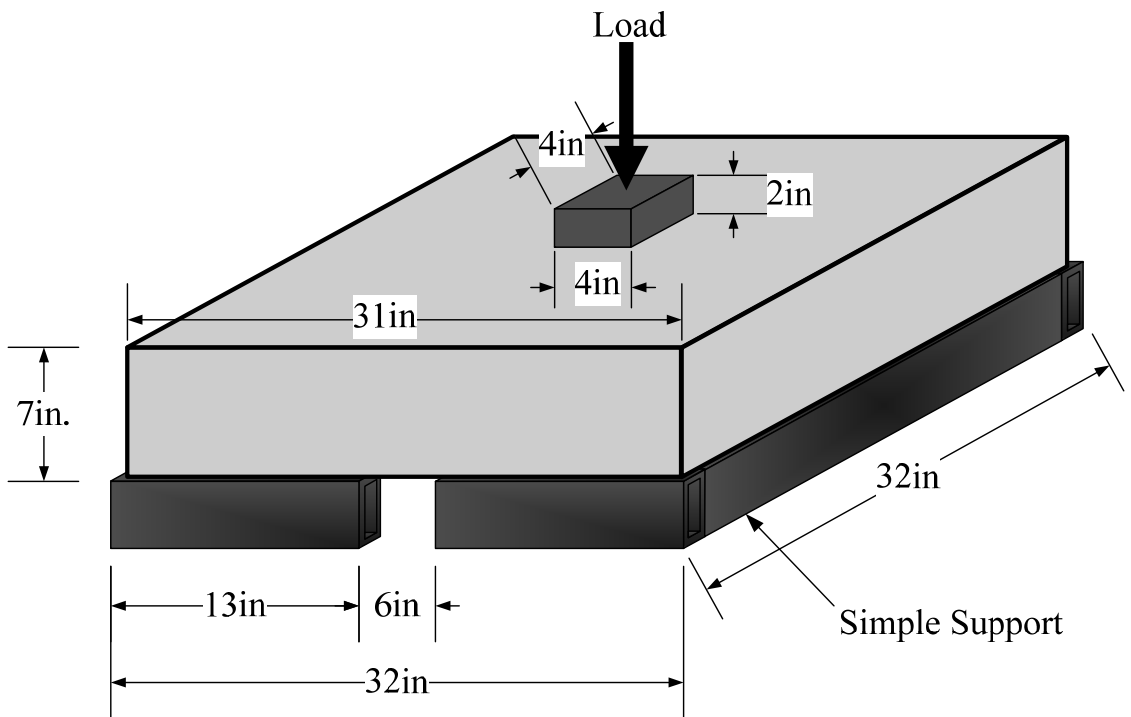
Punching shear slab test setup (Likhitrungsilp, 2006)
